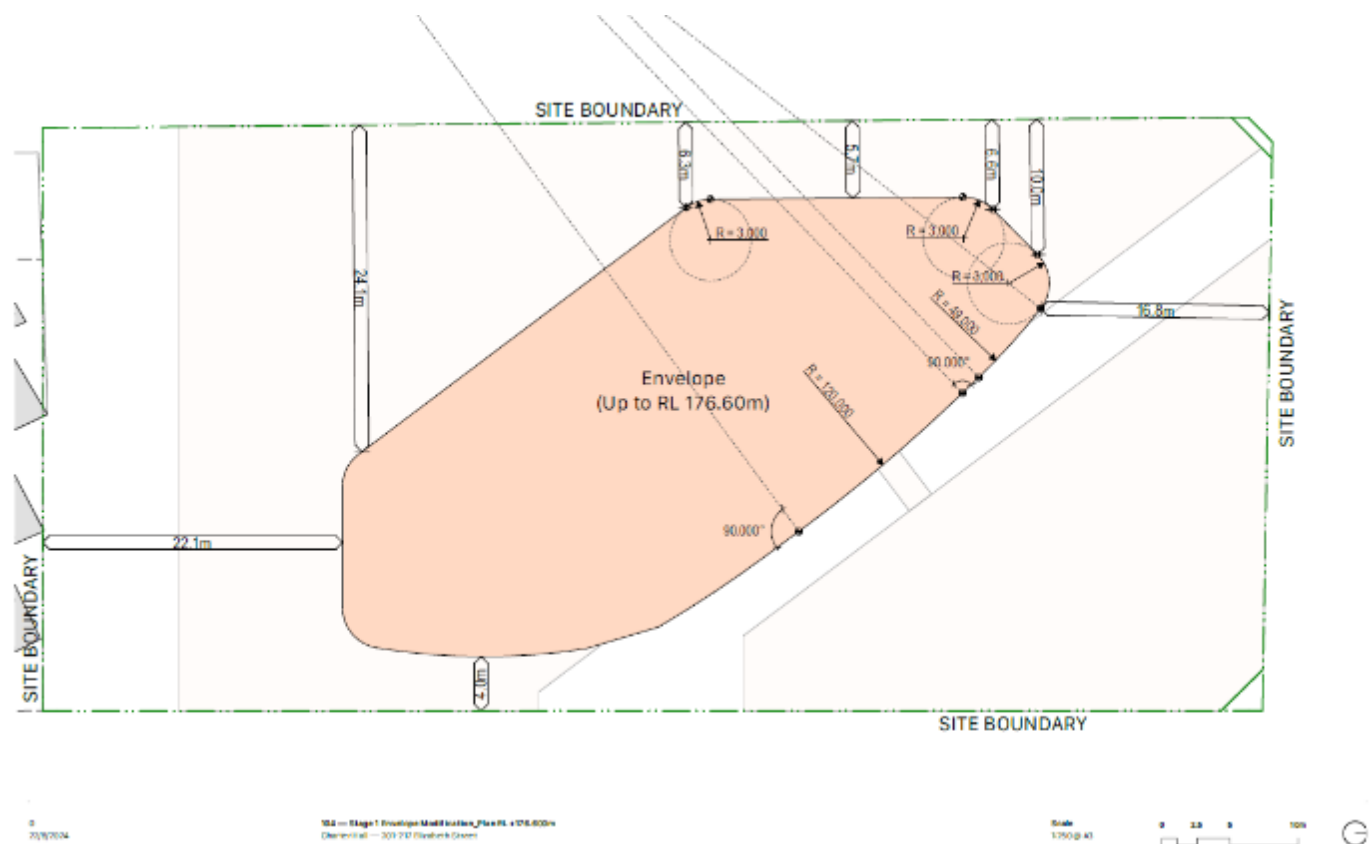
| Proposed high-rise tower (up to RL 176.600) (Source: Ethos Urban modification plans)
